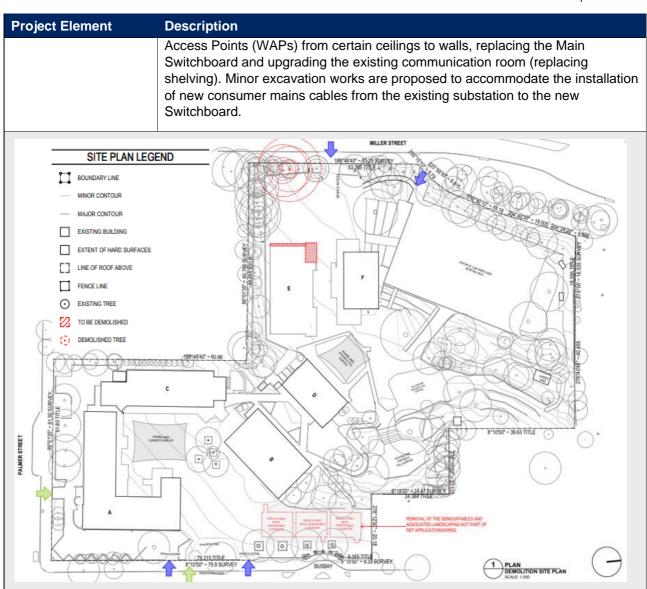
Demolition plan (Source: Fulton Trotter Architects)
